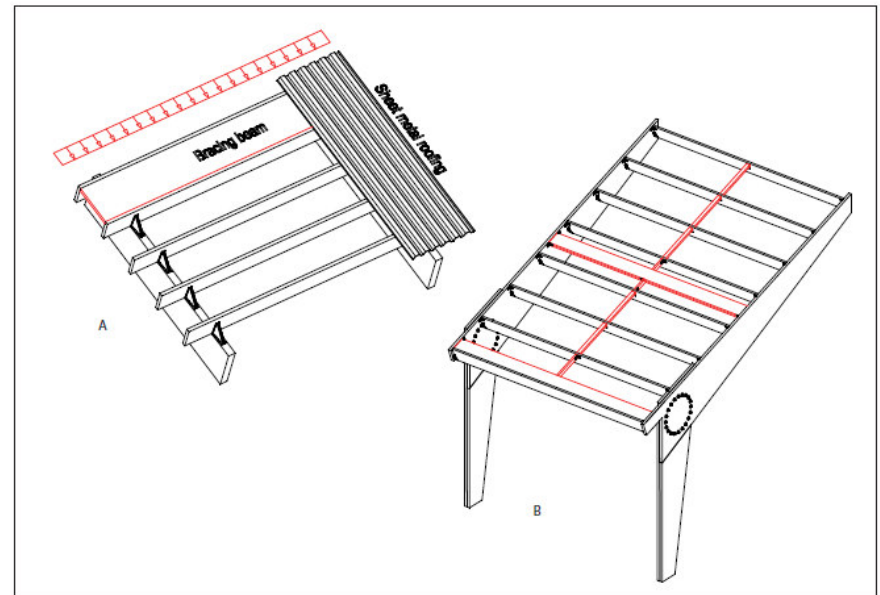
LVL purlins installed perpendicular to roof surface. Bracing beams are needed in purlin width directions. A) Steel sheeting transfers lateral torsional buckling support forces to the bracing beam B) Wooden batten side supports at the mid span transfer loads perpendicular to the span to bracing beams.
